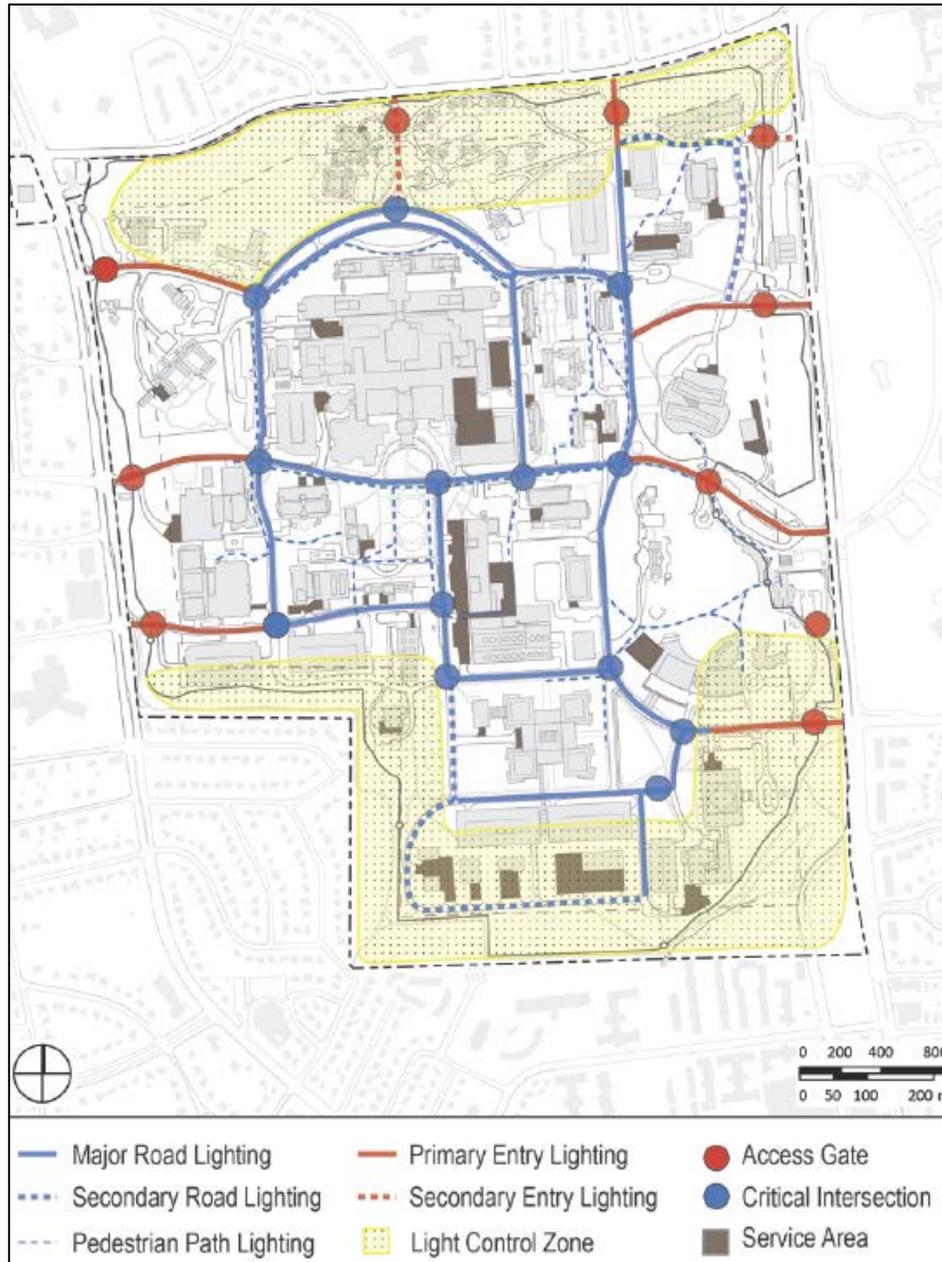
NIH-Bethesda Campus Lighting Concept Plan
